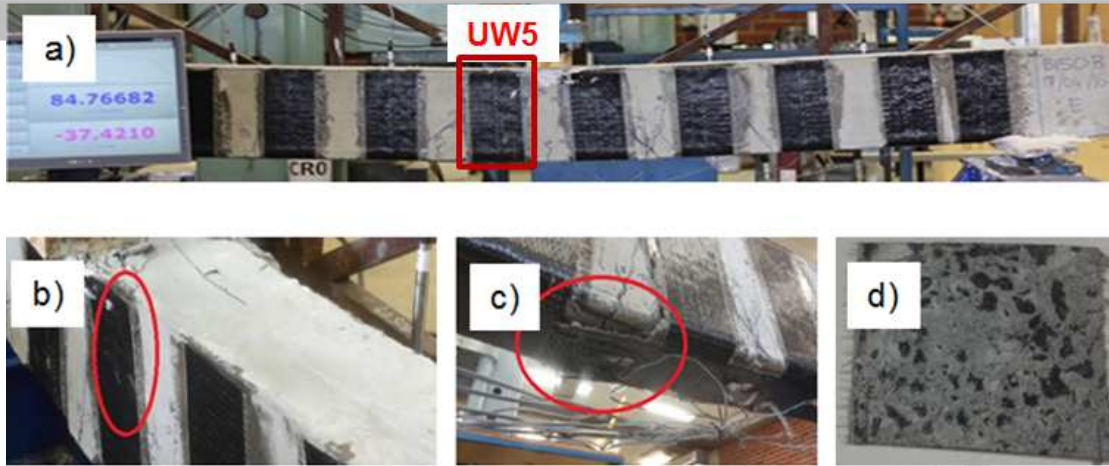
(a) Failure mode of Beam B150B; (b) U-jacket debonding; (c) Rupture of the soffit strip; (d) BFRP/Concrete interfacial failure of U-jacket UW5
